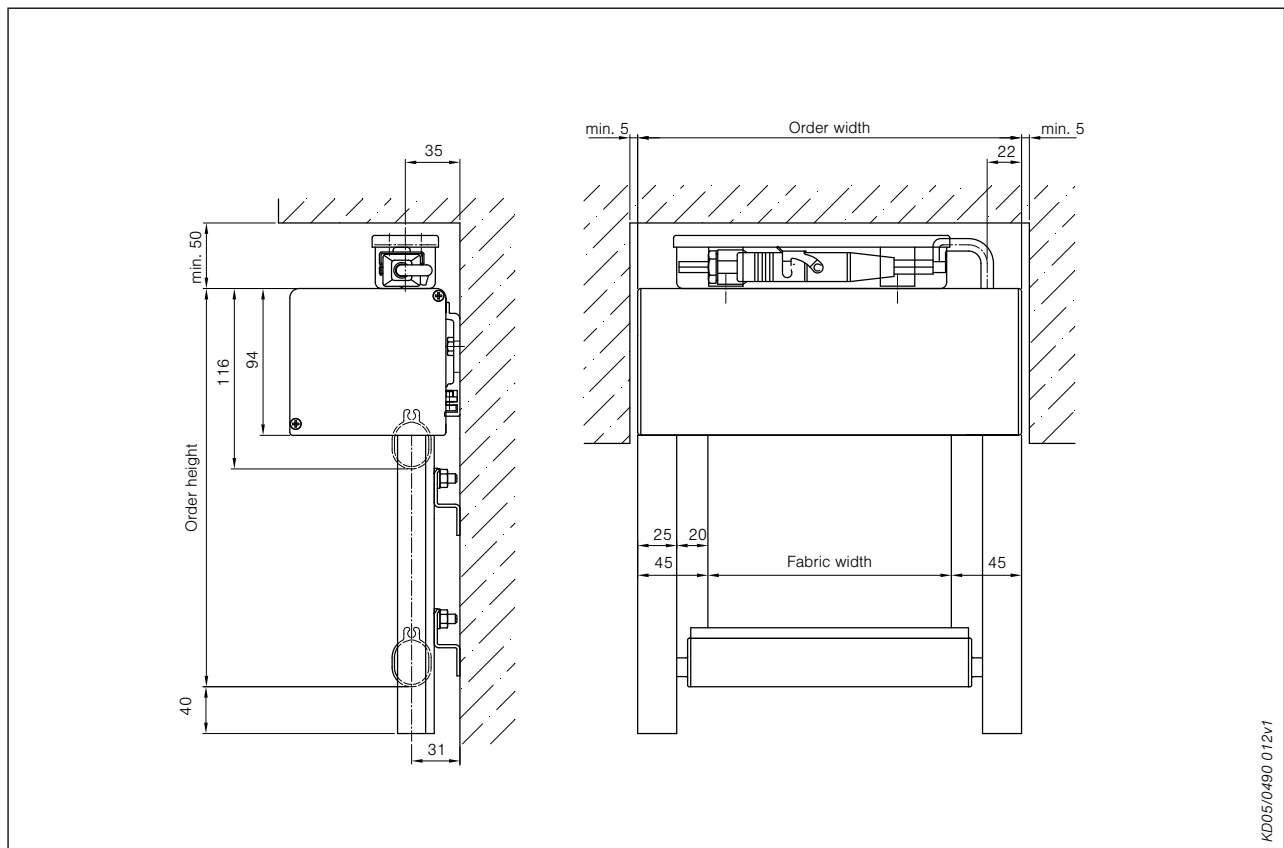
Individual unit, left rolling blind (also available as right rolling blind), wall installation, guide rail, with cable exit at the top
